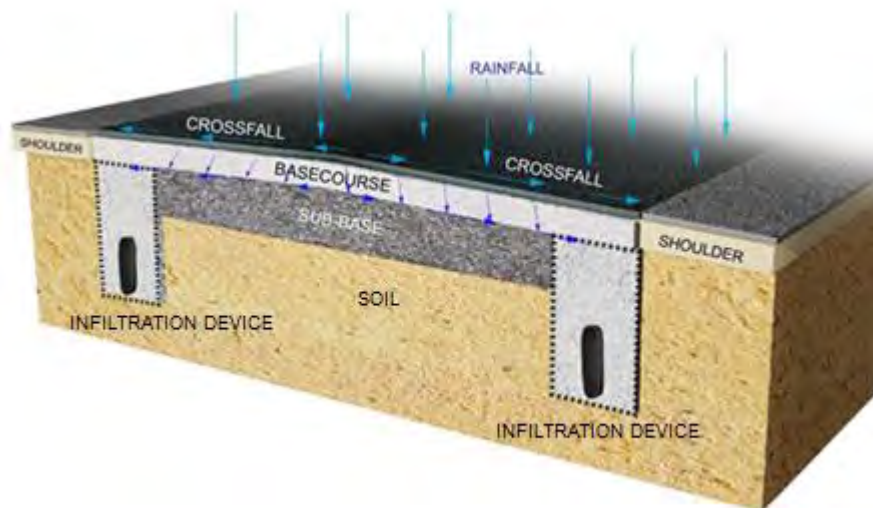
Schematic of a cross-section through a road which shows the concept of road drainage using infiltration devices constructed on either side of the road. (Adapted from Source: geosynthetica.com)
